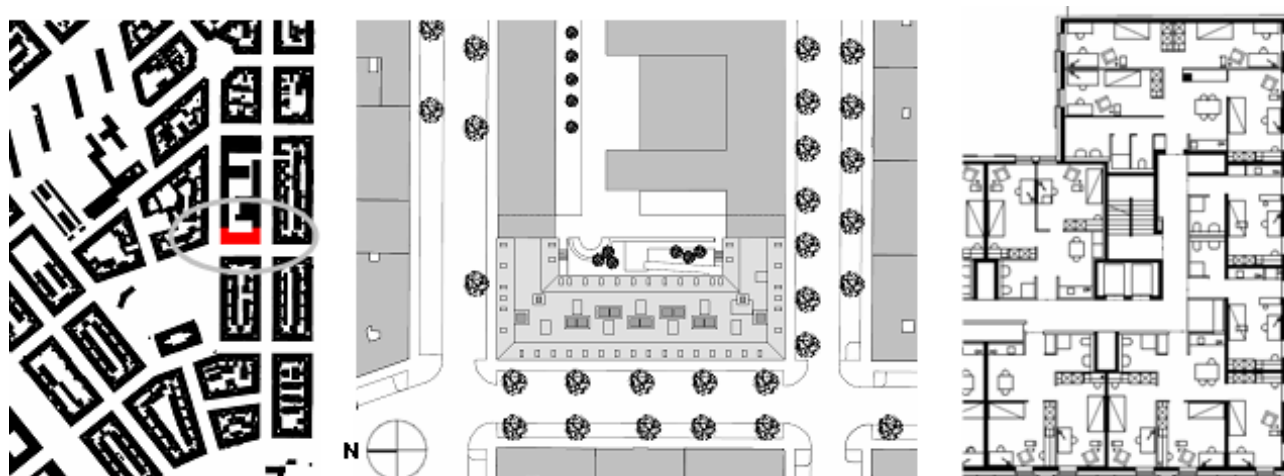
Site plan and floor plan of Students' Hostel Molkereistrasse. Source: Baumschlager Eberle P.ARC
